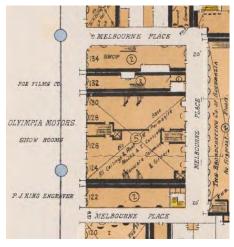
A fire survey plan surveyed in 1924 showing the internal plan of the building at 124-130 Russell Street. (Source: SLV)
